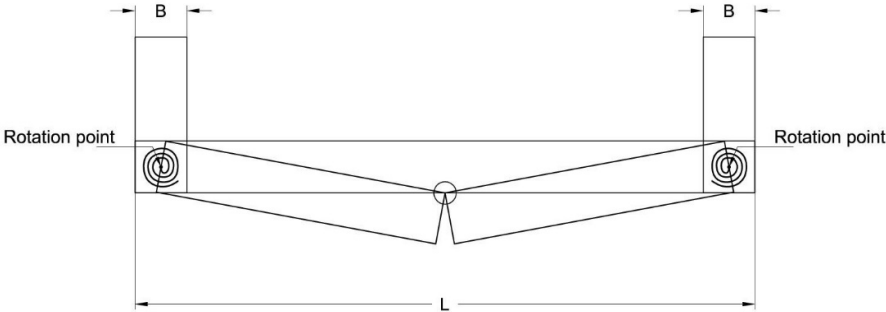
39 – Collapse mechanism for the rigid beam between rigid orthogonal walls
